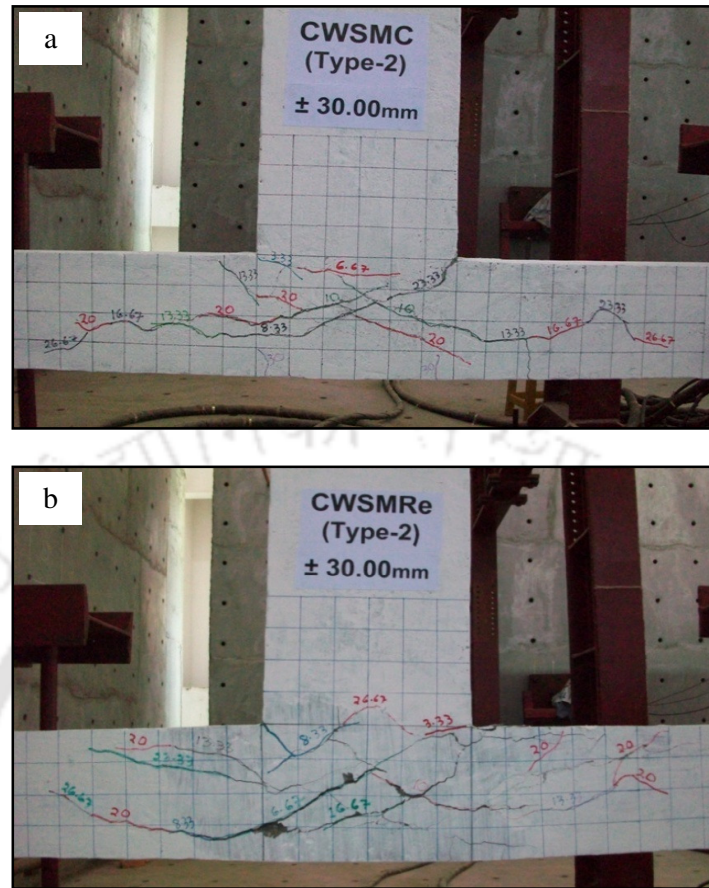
CWSM specimens at the end of test under loading type-2:
